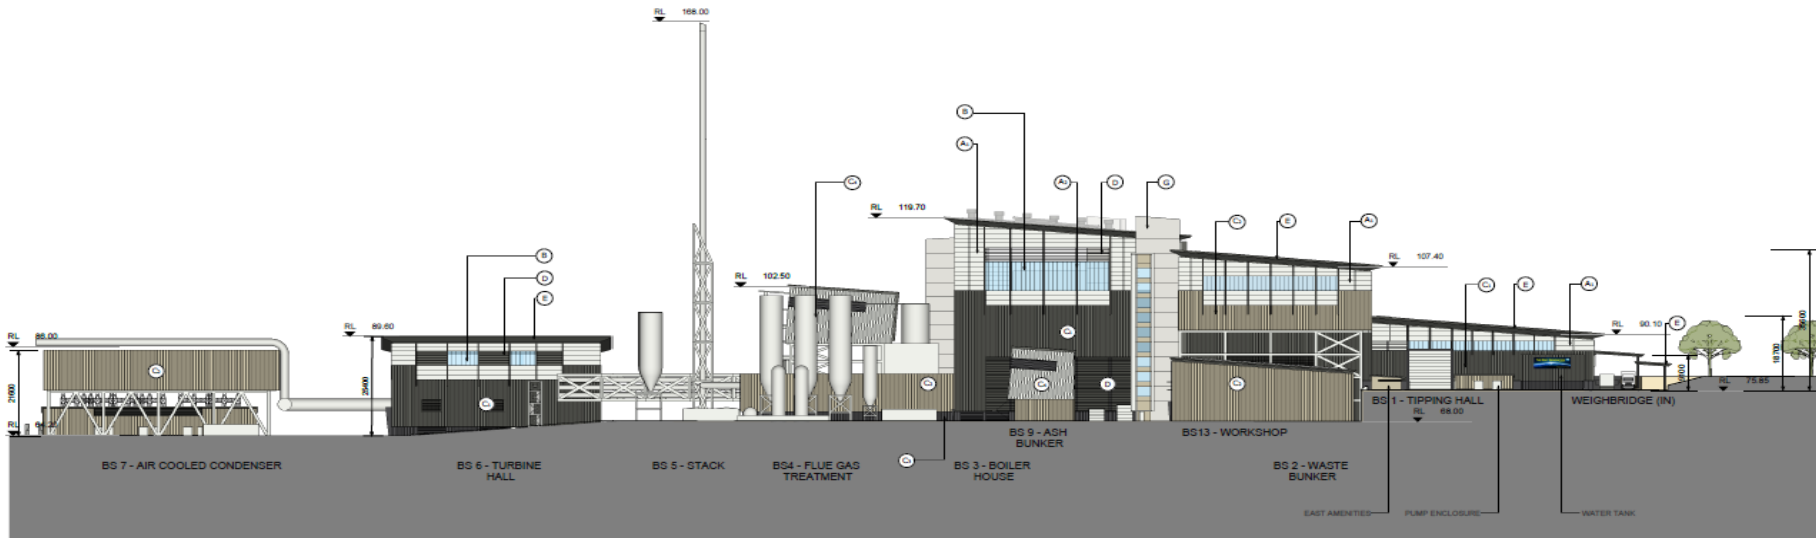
Southern Elevation (source: Krikis Taylor Architects, 2015)
